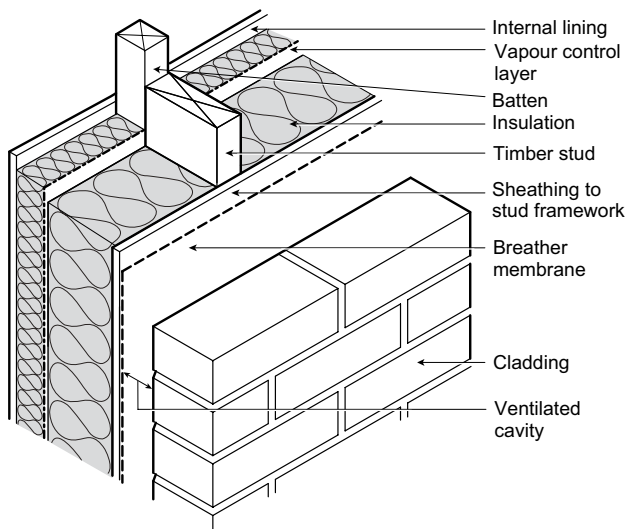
Typical brick clad timber frame wall (insulated service zone added in 2010)
